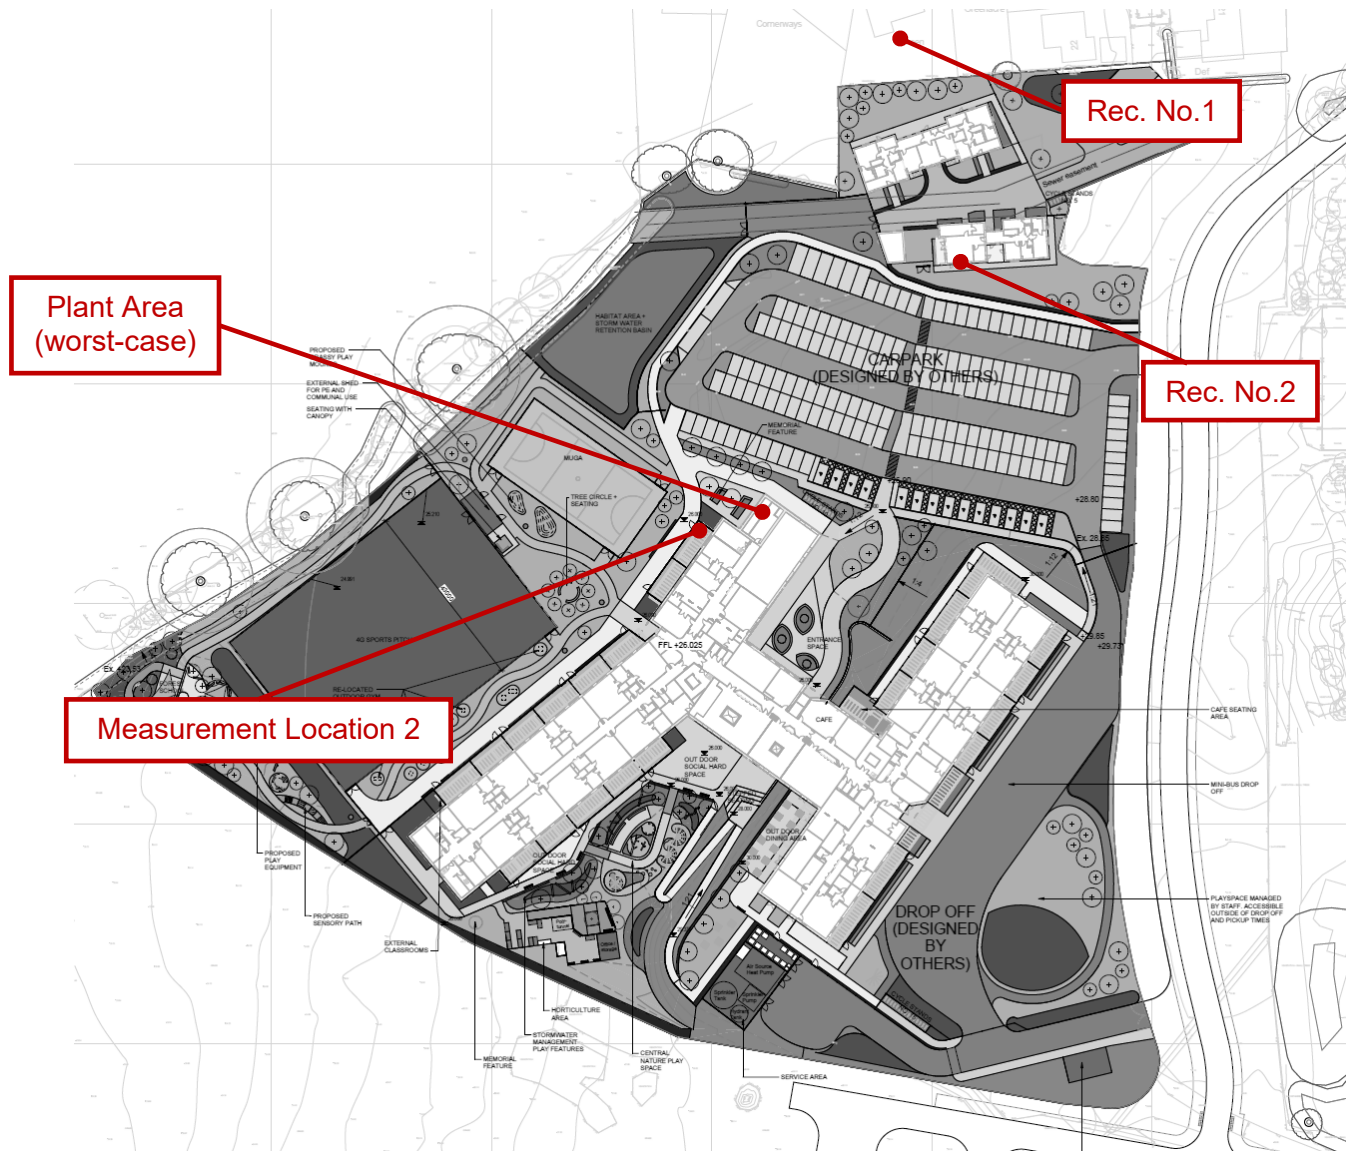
SITE PLAN SHOWING PROPOSED PLANT AREA AND NEIGHBOURING NOISE SENSITIVE RECEIVERS
